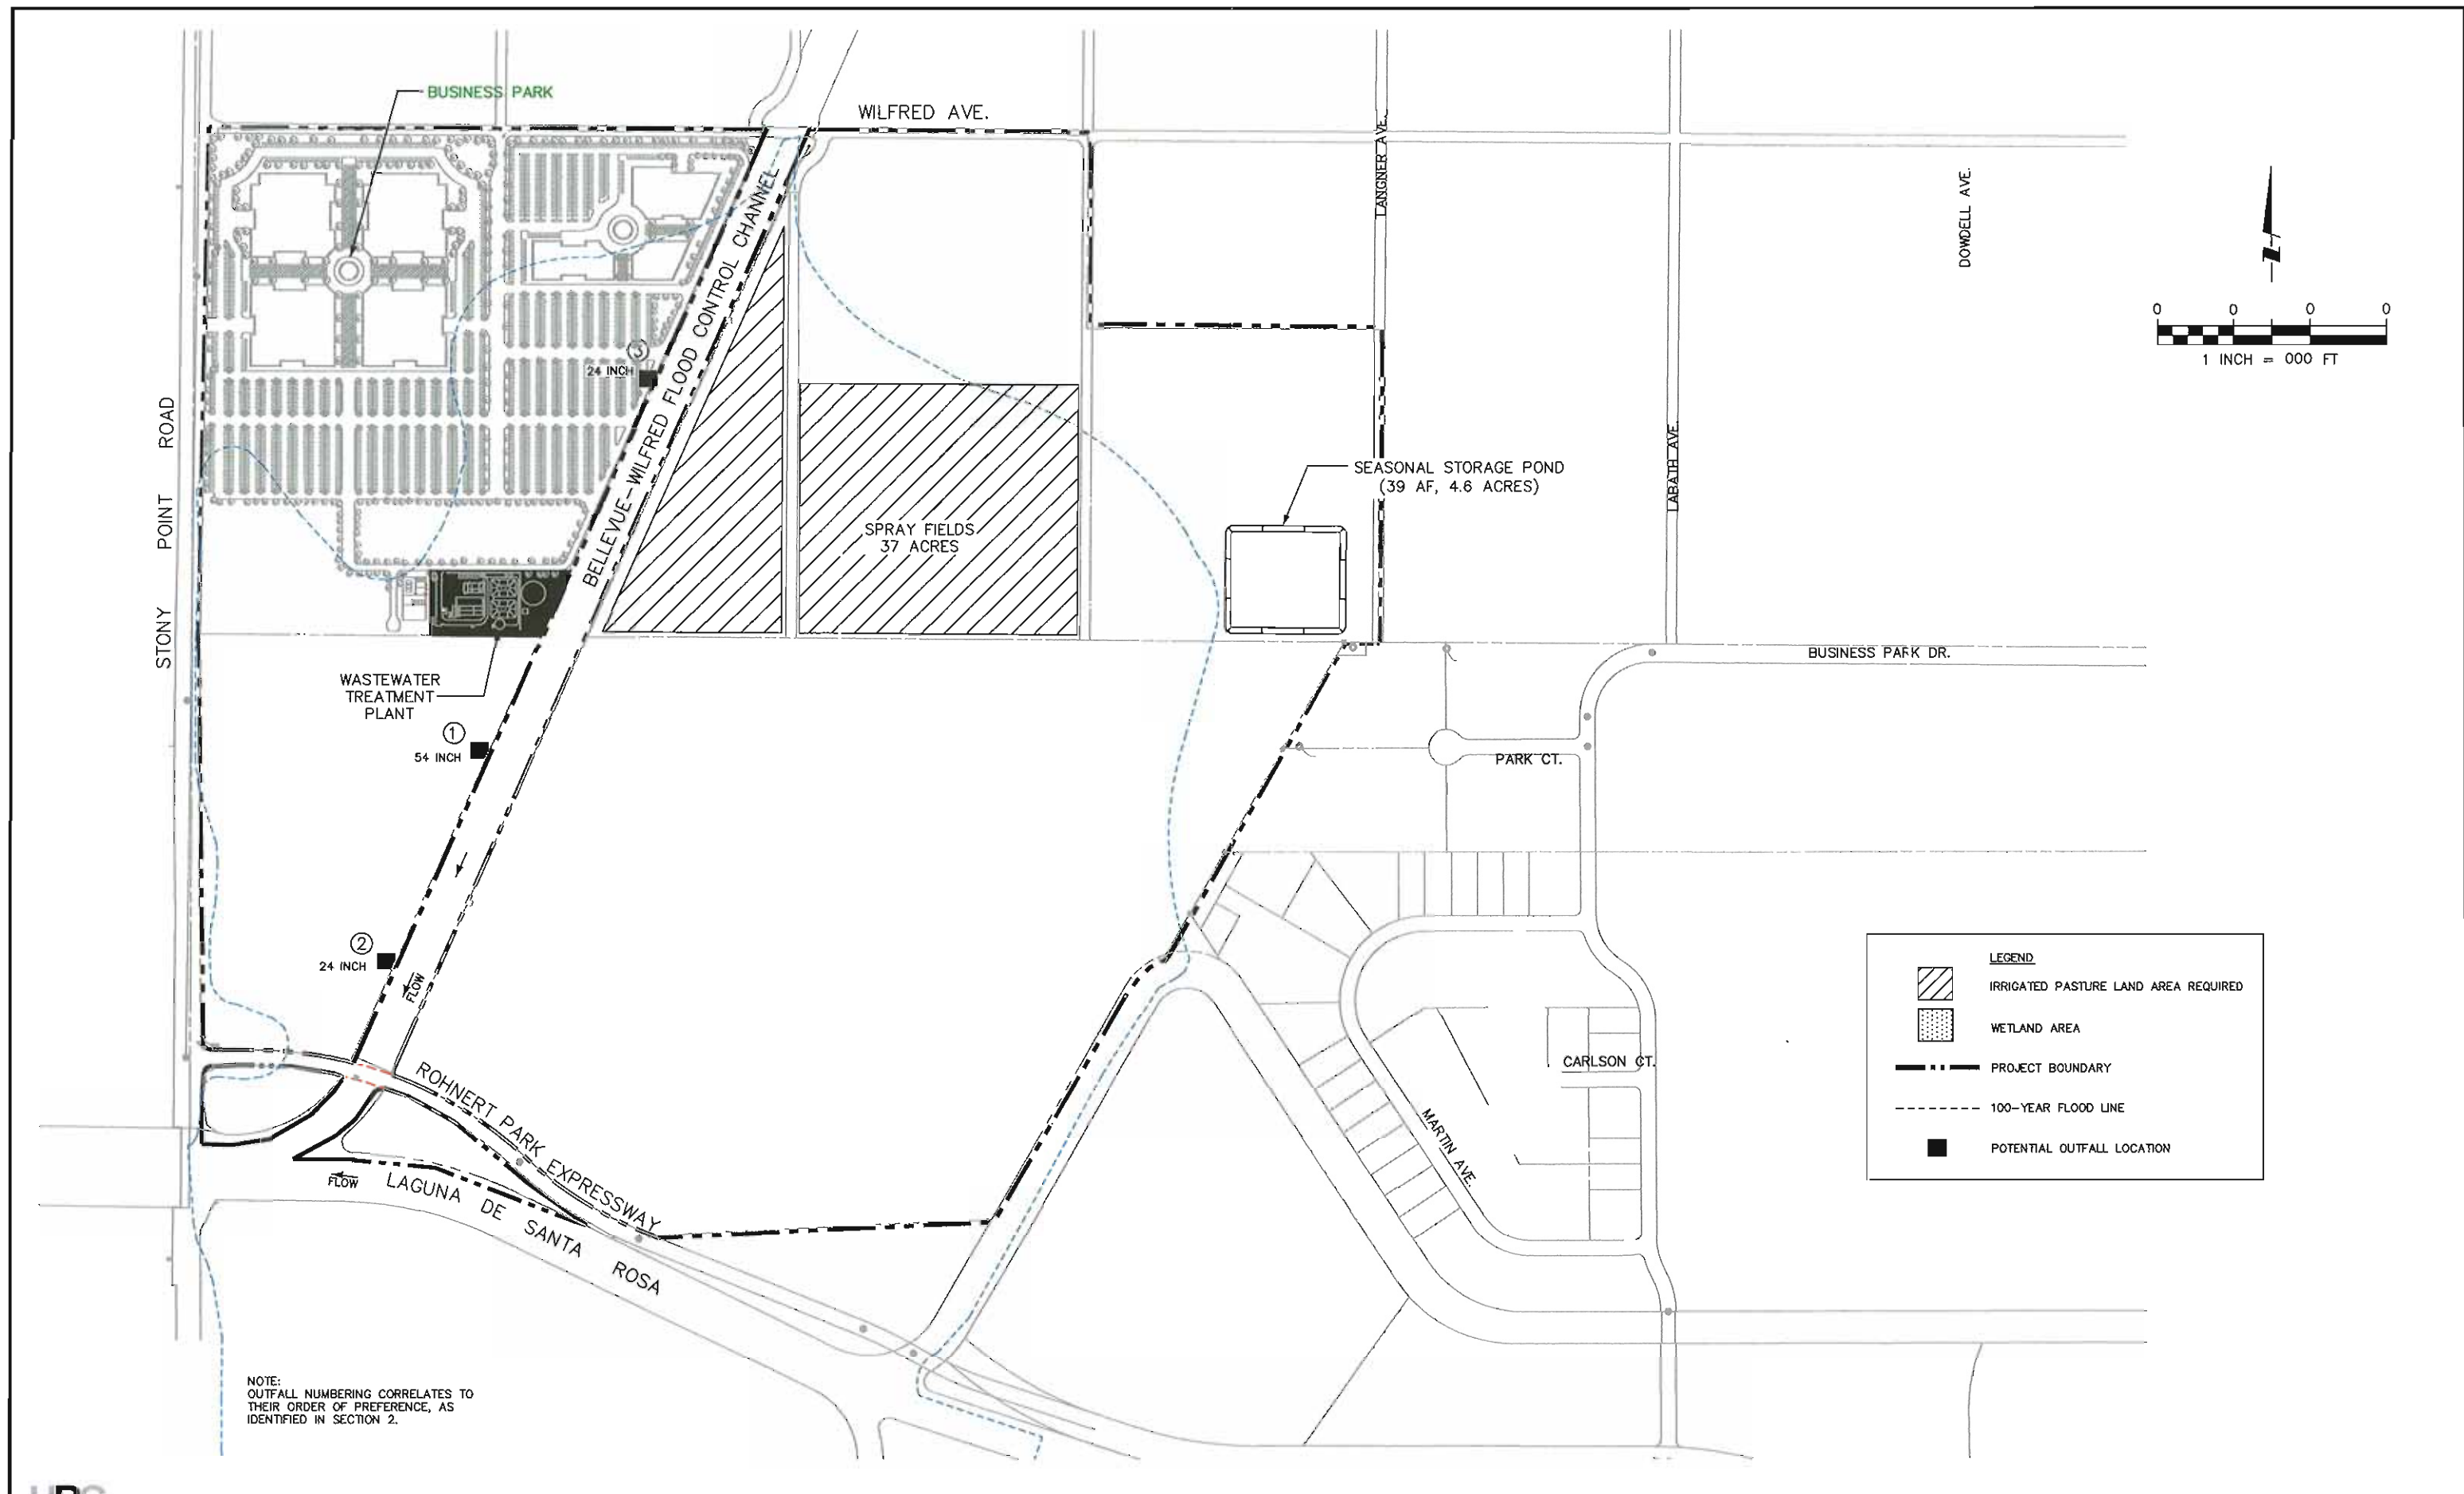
Project Development Plan for Alternative E - Wet Season Storage (Alternative E2)
